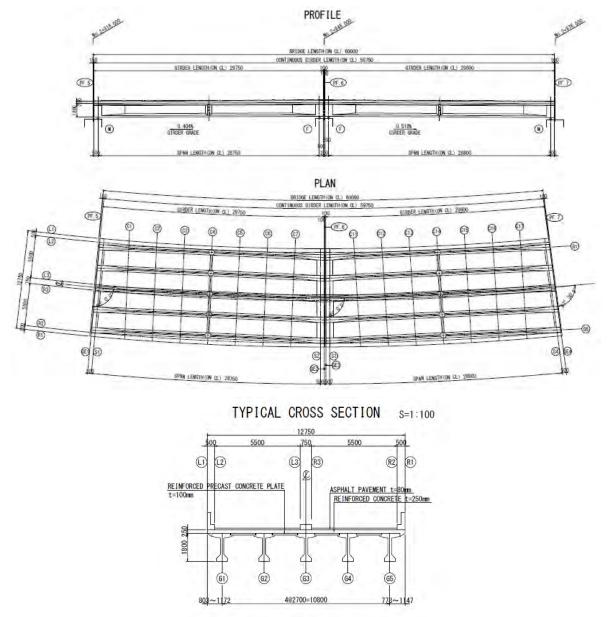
Plan, Profile and Typical Cross Section of Steel-I Girder Bridge in the B/D
